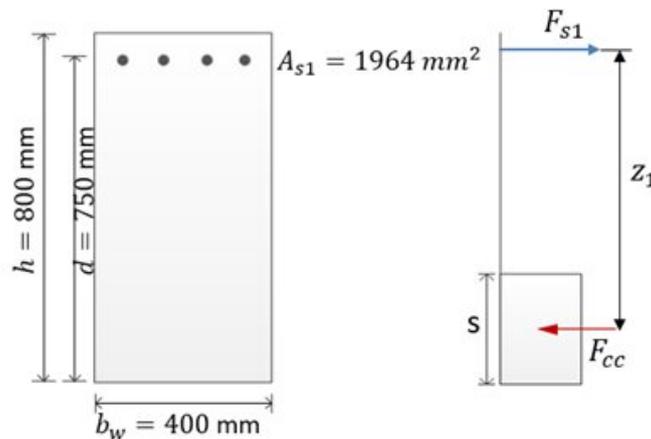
Forces in cross-section with only half the tension reinforcement.
